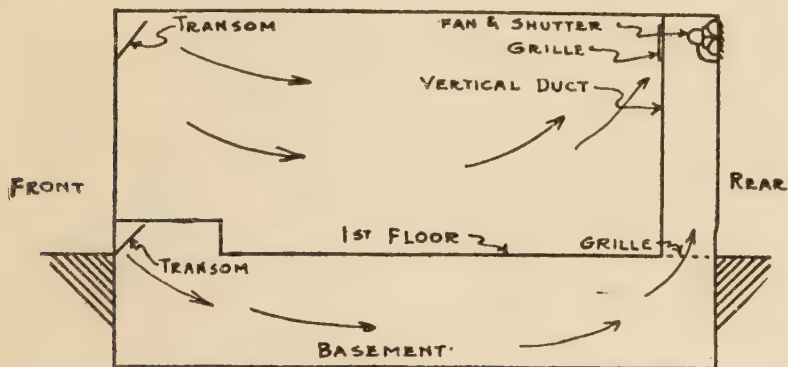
A basement as well as the first floor can be ventilated by placing a fan in the rear of the building at the ceiling of the first floor with a vertical duct running to the ceiling of the basement as shown.
